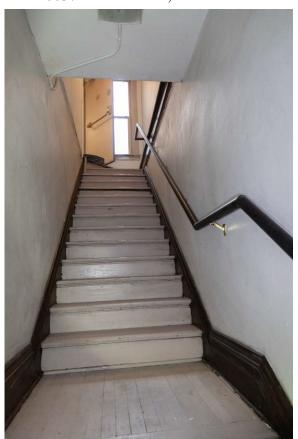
Second floor, northwest stairwell, down up from the intermediate landing at the 705-1/2 West Second Avenue entrance.
